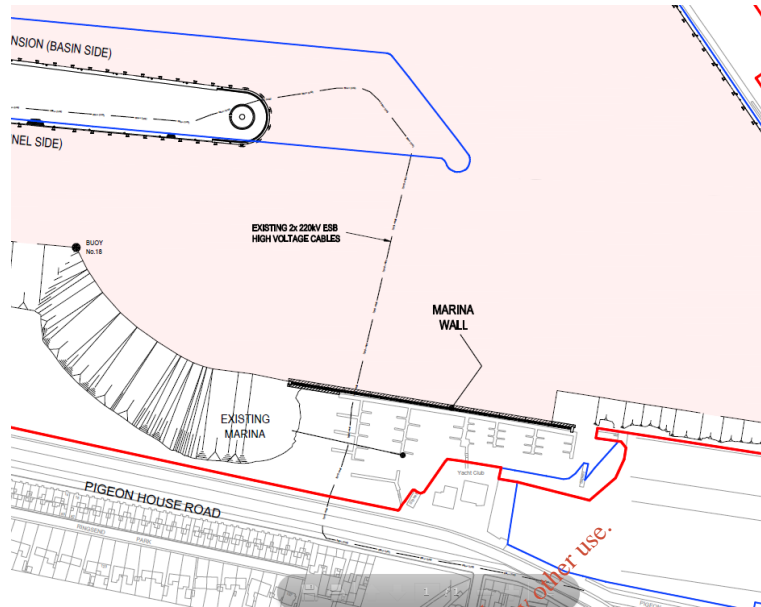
Extract 'Proposed Channel Layout Sheet 1' showing westernmost oil-filled cable crossing
